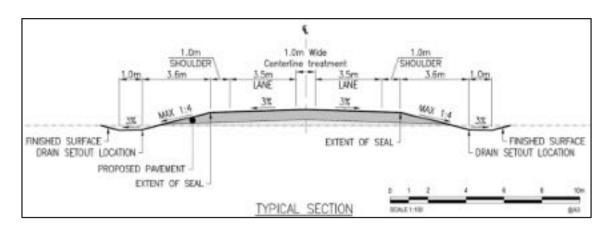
Moura-Baralaba Road—concept design of diverted section
